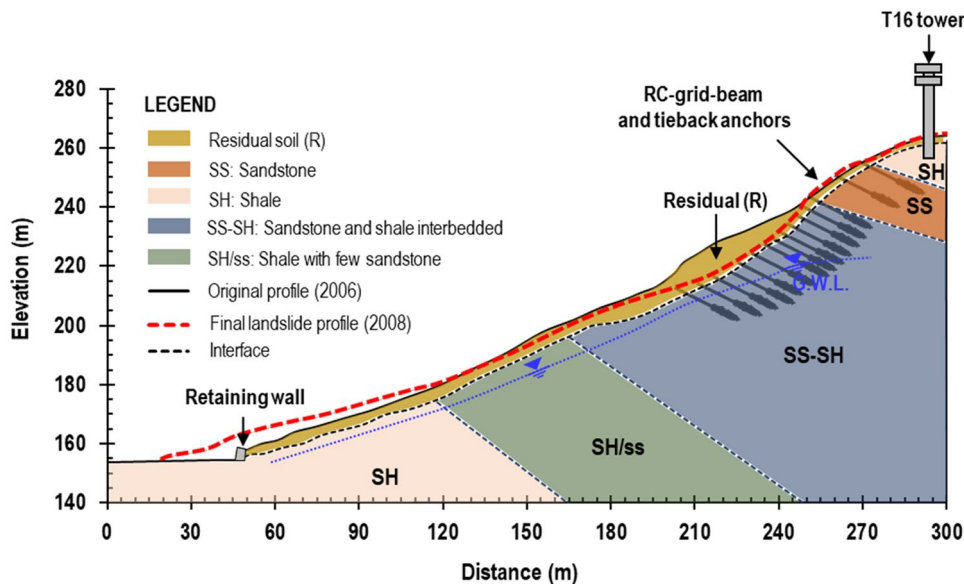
Cross section of the geometry, geological profiles, and ground anchor installed on the anchored slope near the T16 support tower of the Taipei Maokong Gondola System
